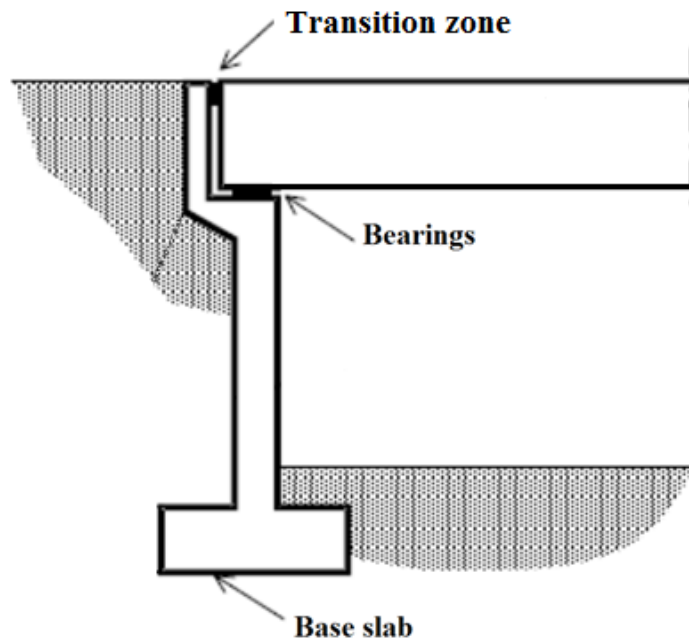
How a transversally prestressed glulam slab is fitted to a freestanding abutment, WebLCC (2011)
